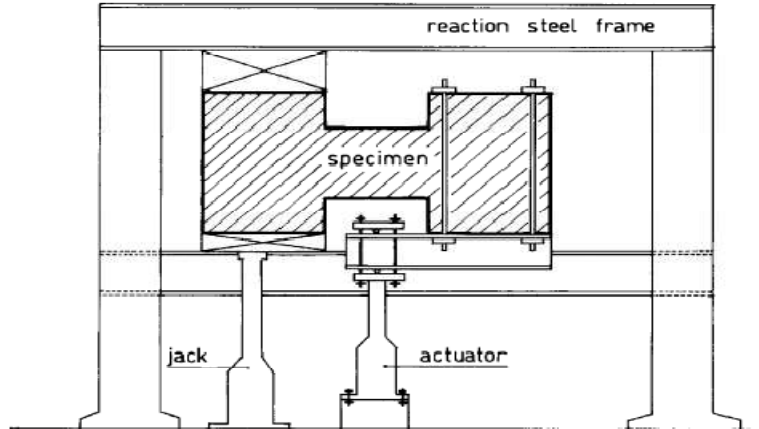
Boundary Condition and Testing Mechanism for Coupling Beam Specimen
